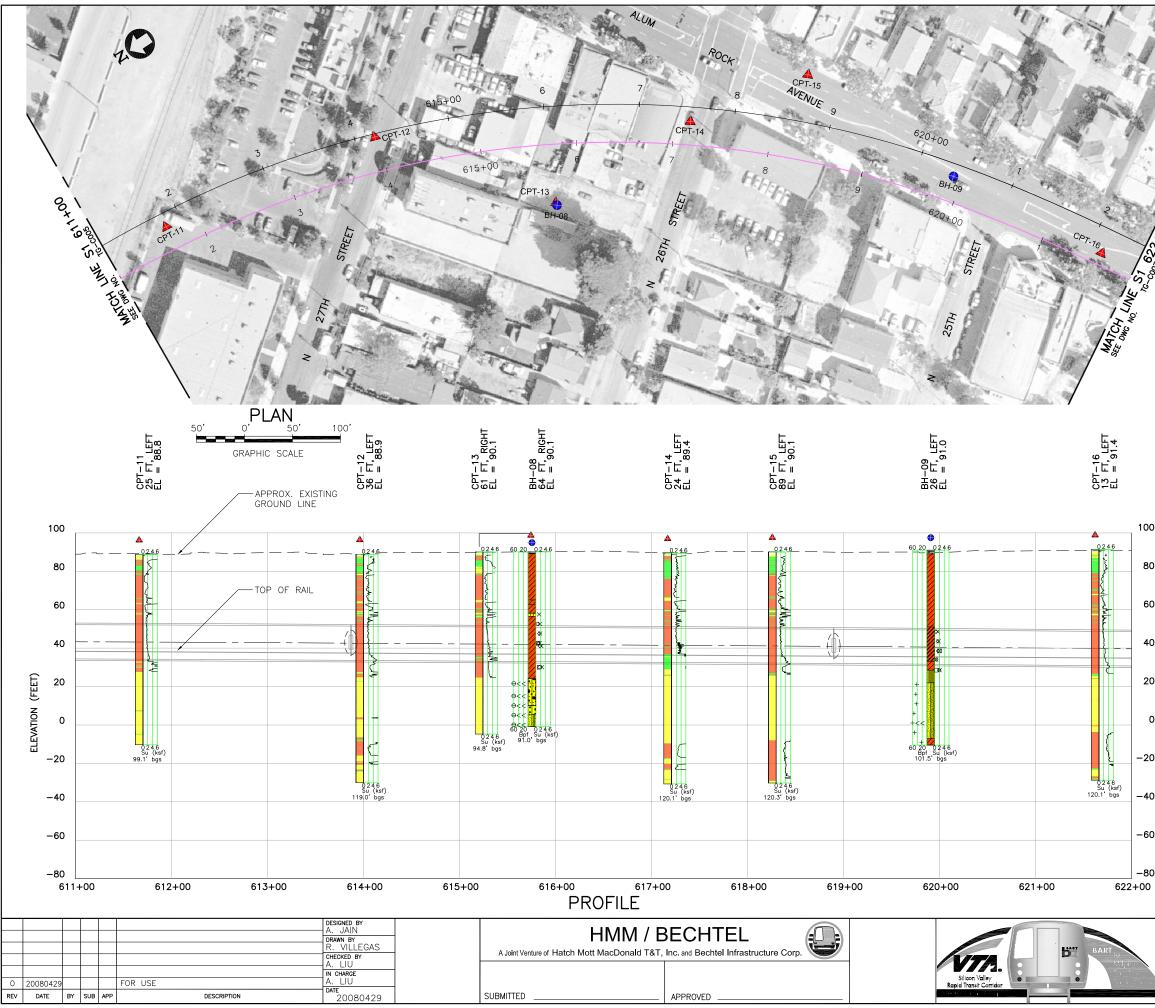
Geotechnical Plan and Profile with Strength Parameters: STA 611+00 to STA 622+00
